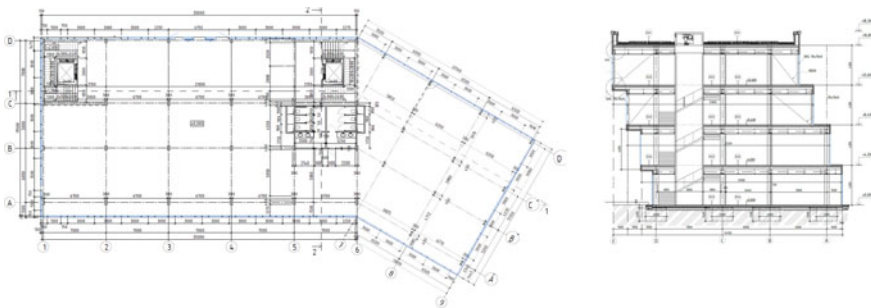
Basic floor plan and section drawing of the reference office building
